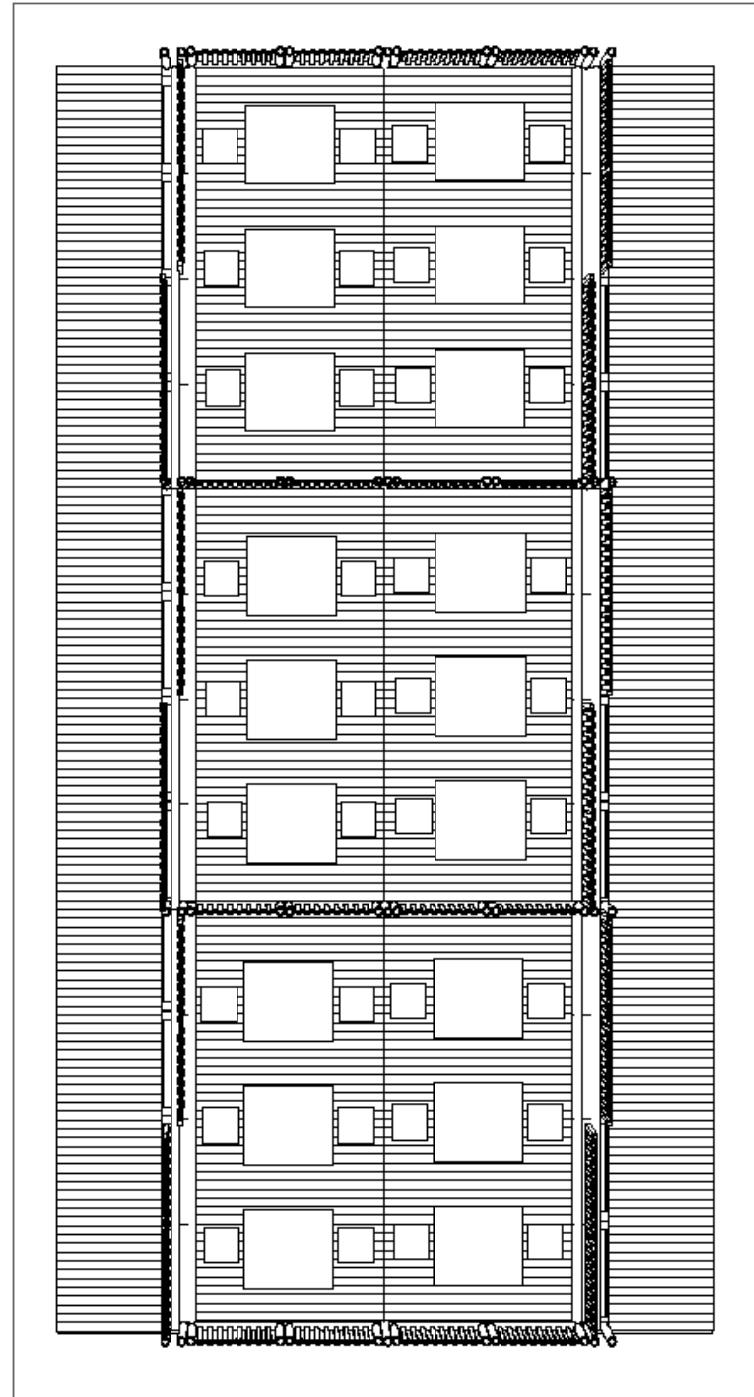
Classroom Floor Plan (Not to scale)
